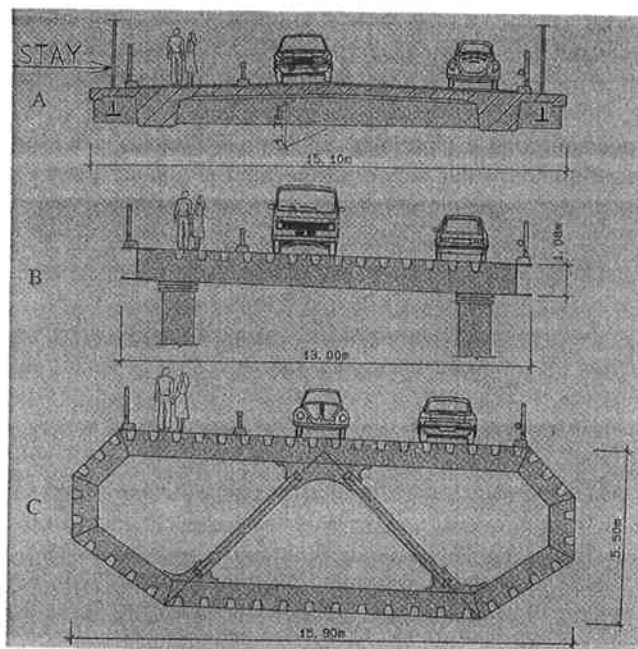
Typical cross-section; A: Cable stayed bridge; B: Steel ramp; C: Steel girder
